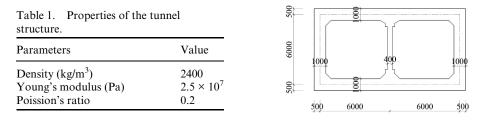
Cross-section of rectangular tunnels (unit: mm).
